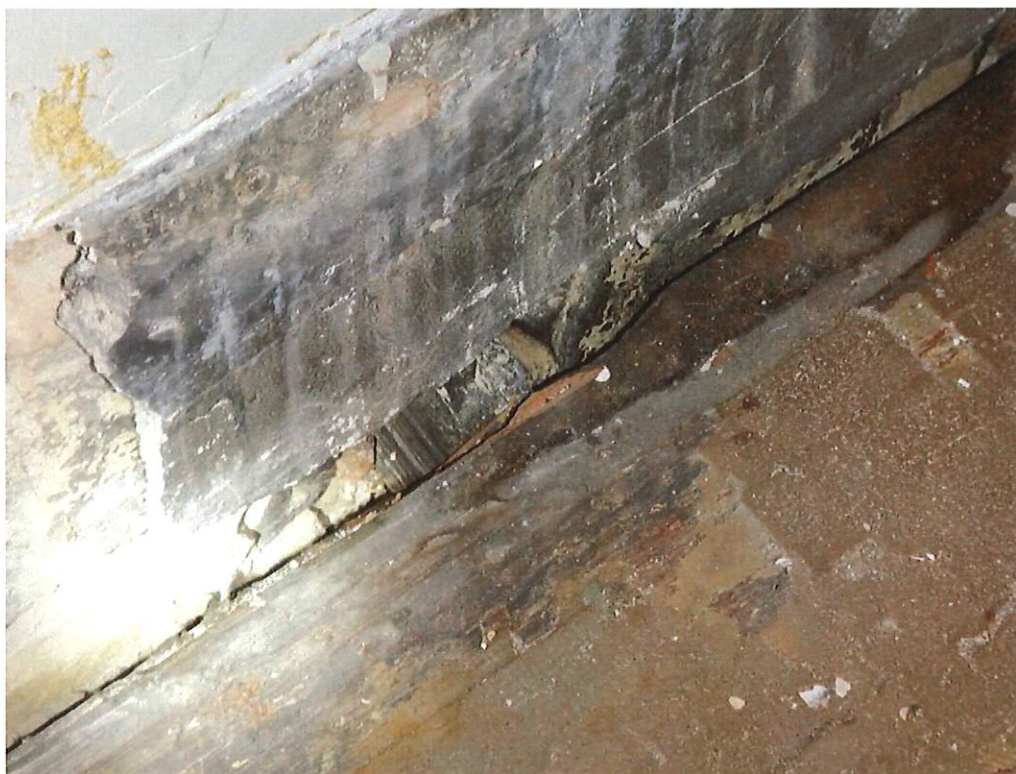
Gap between the floor covering and the masonry wall on the upper floor.
